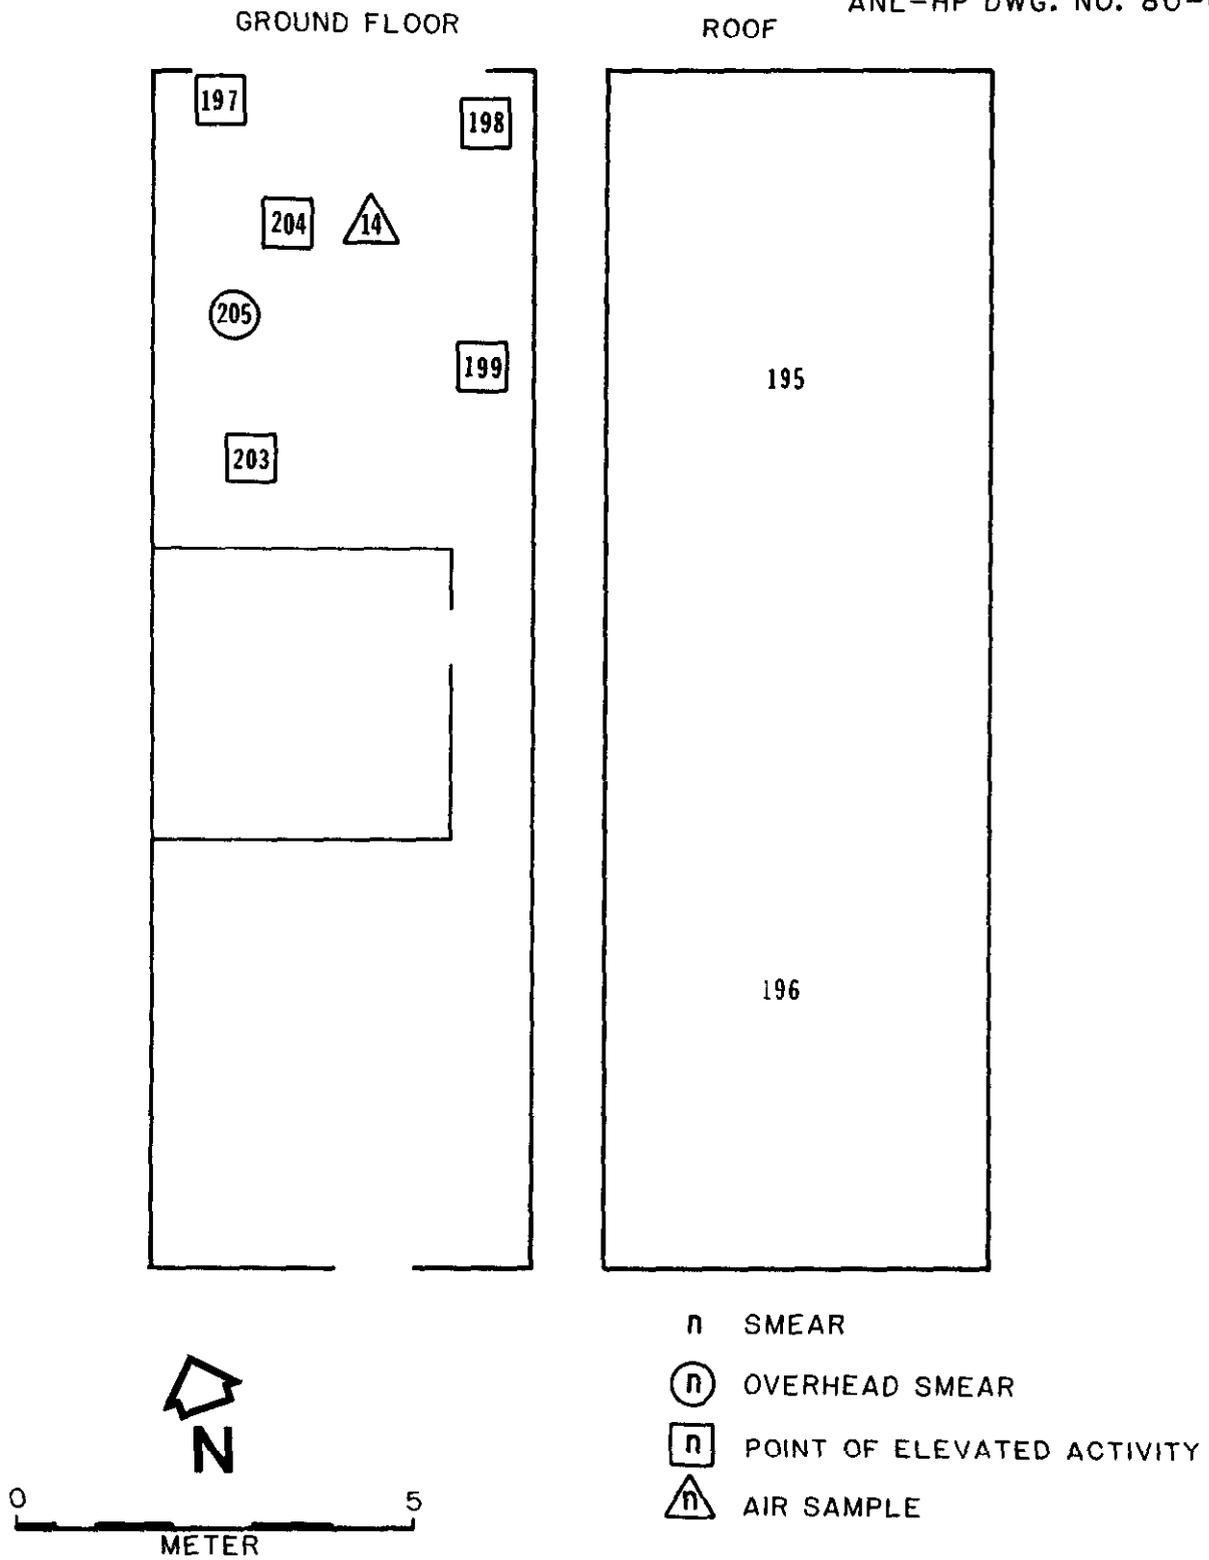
Department 1 Office Ground Floor and Roof Survey Locations.
